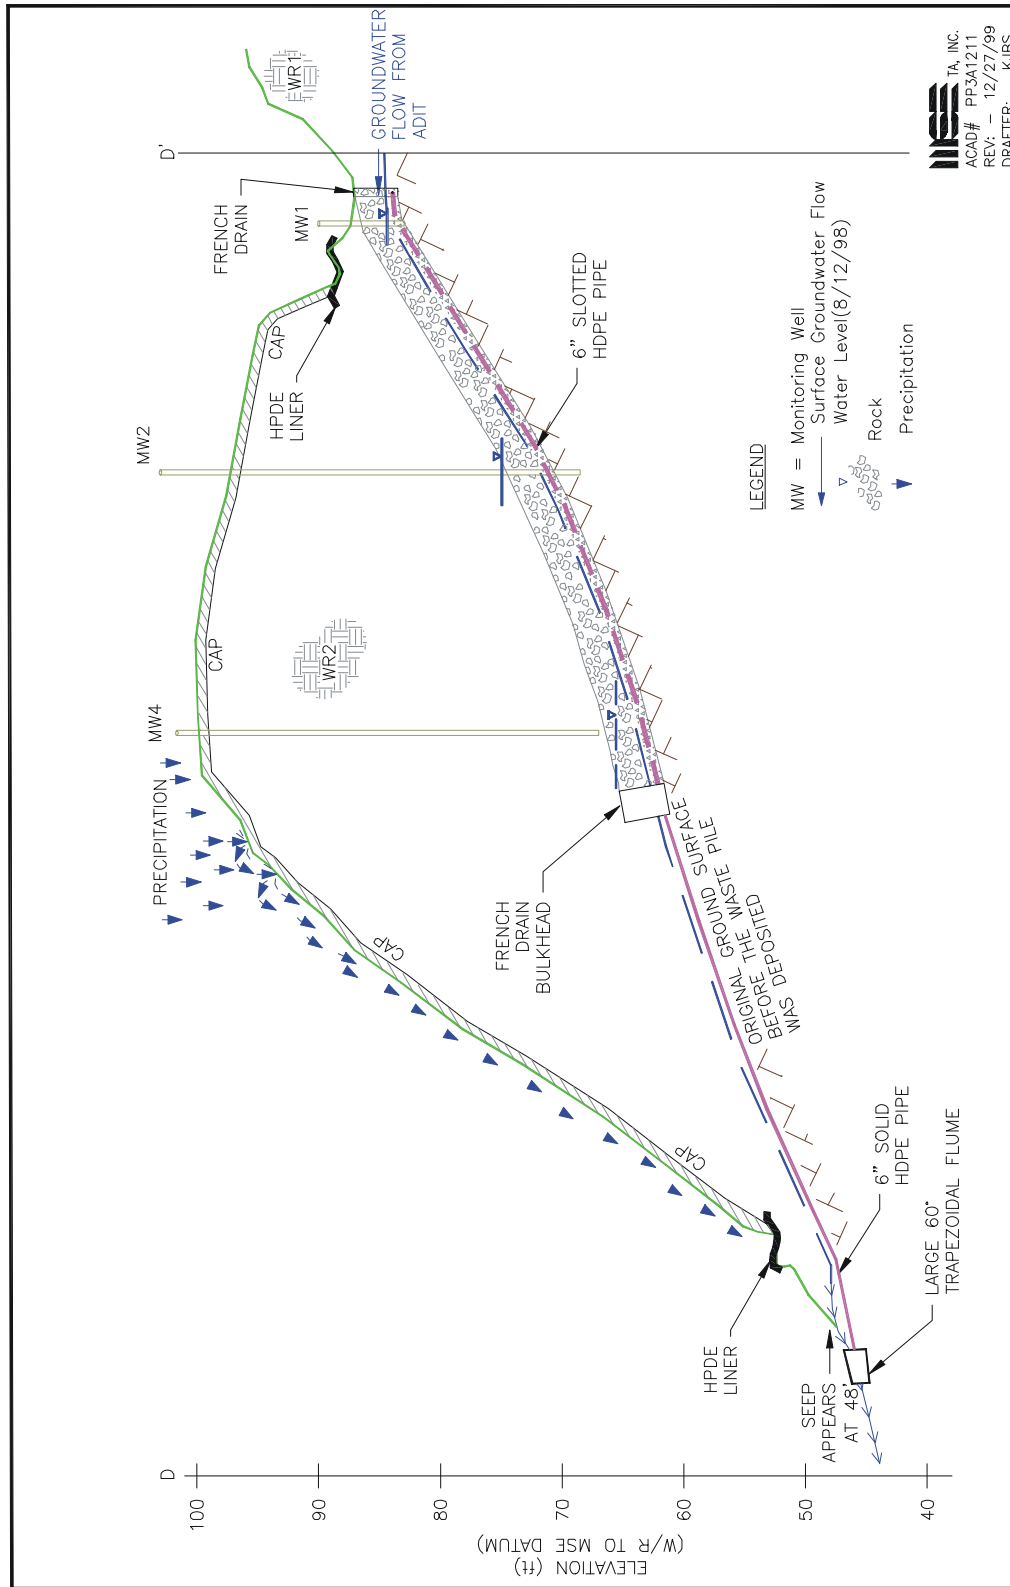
Cross section of surface waste pile (WR2) with installed French drain and grout cover (not to scale).
